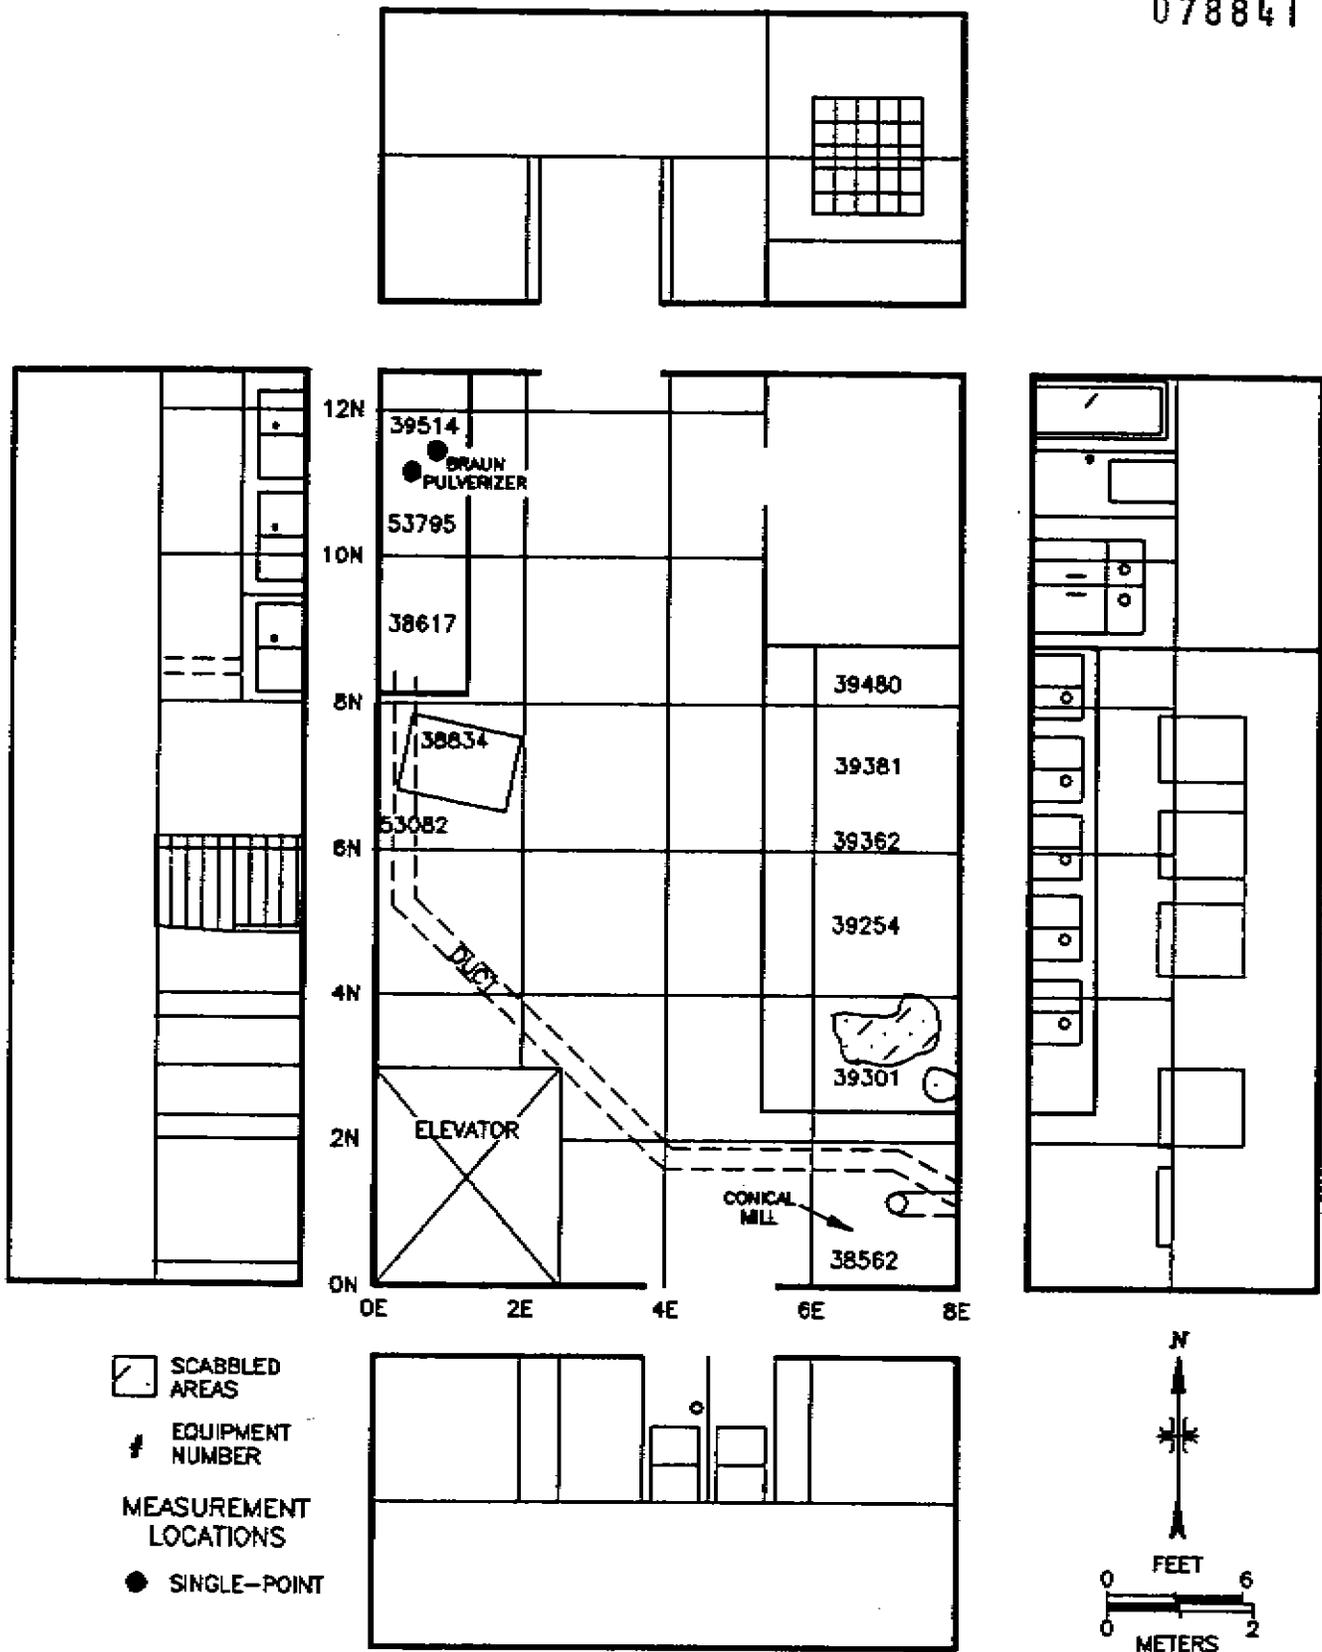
Building 23, Crusher Room, First Floor, Indicating Measurement Locations
